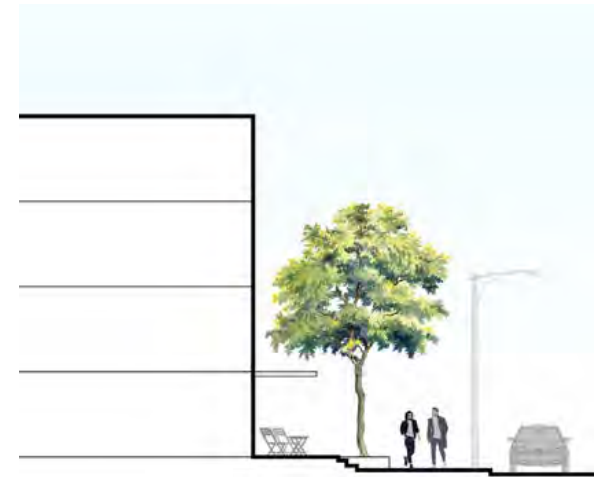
Building 1A frontage on Elizabeth Lane (Section 2)
